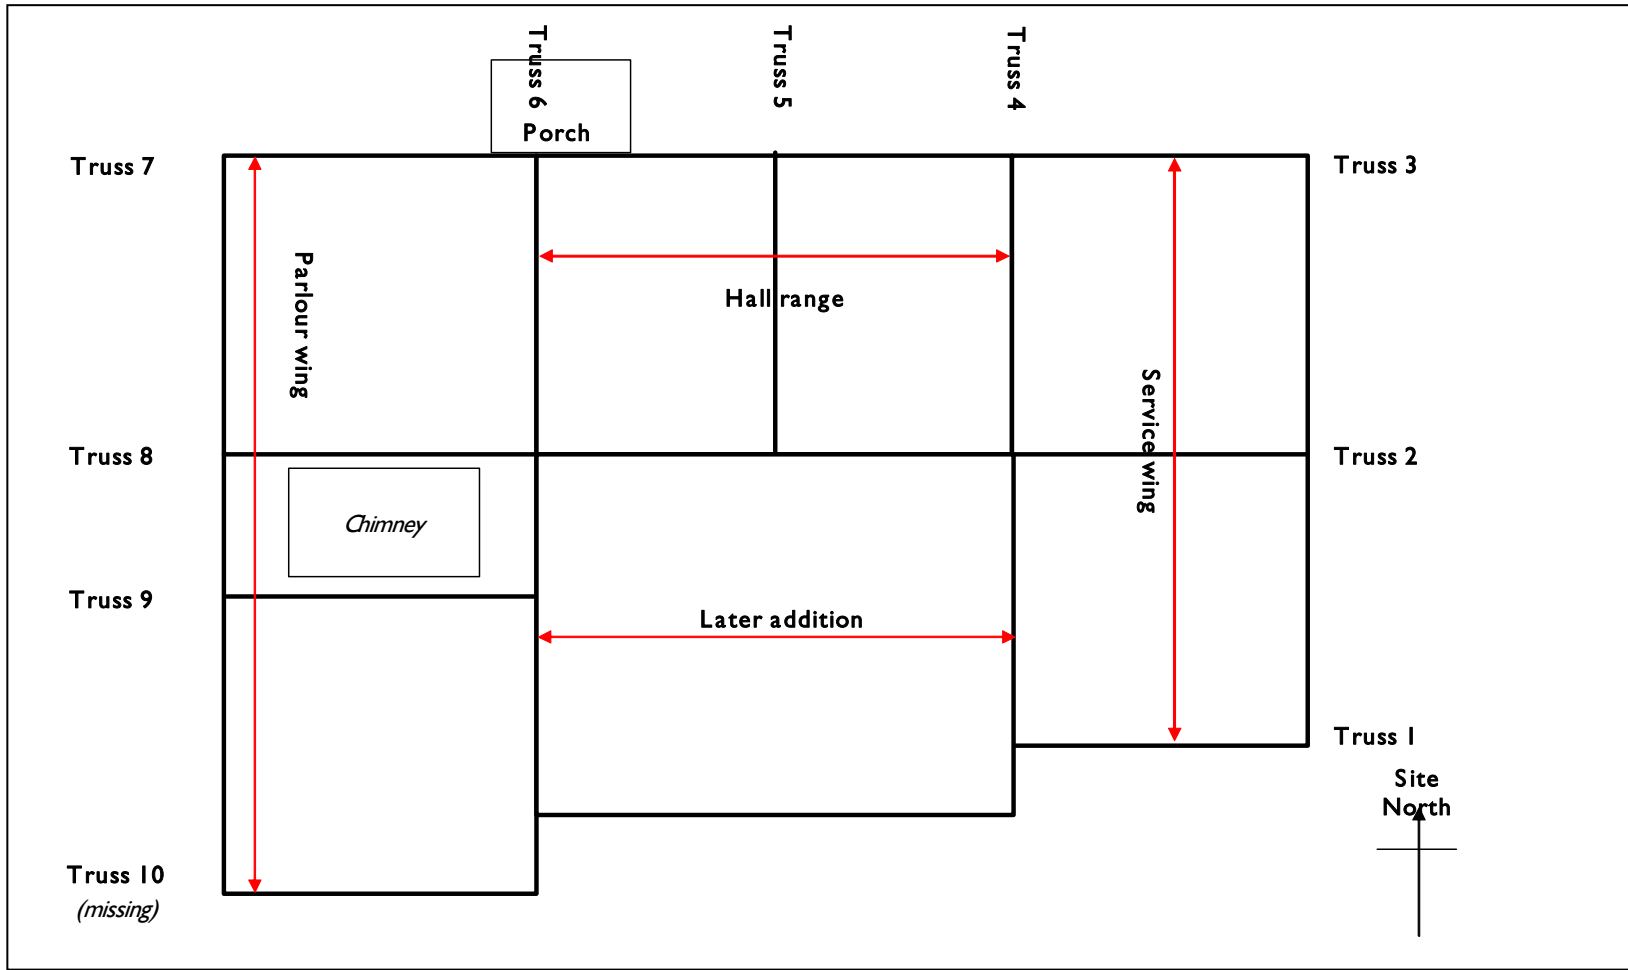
Simple schematic plan of The Oak House to show layout and roof-truss position (after Birmingham Archaeology)
